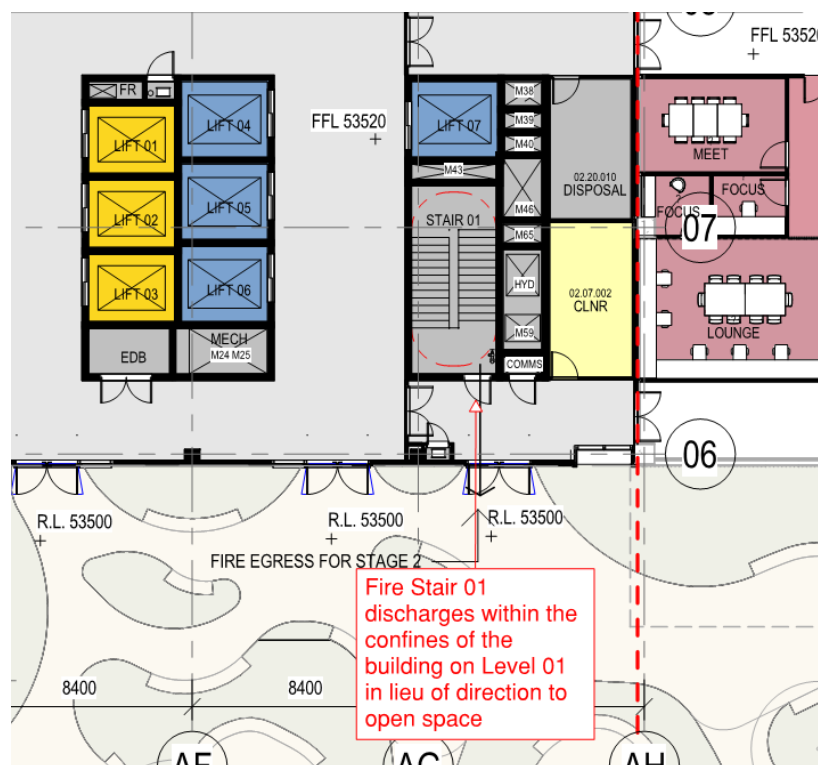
Fire Stair 01 discharging into the confines of the building on Level 01
